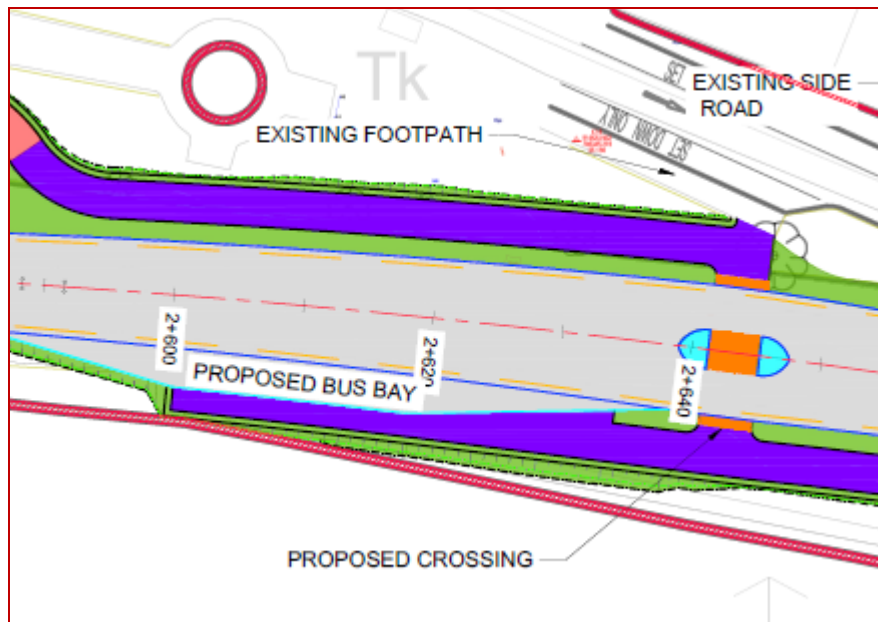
Shared Facility Crossing Point at Breaffy Village
